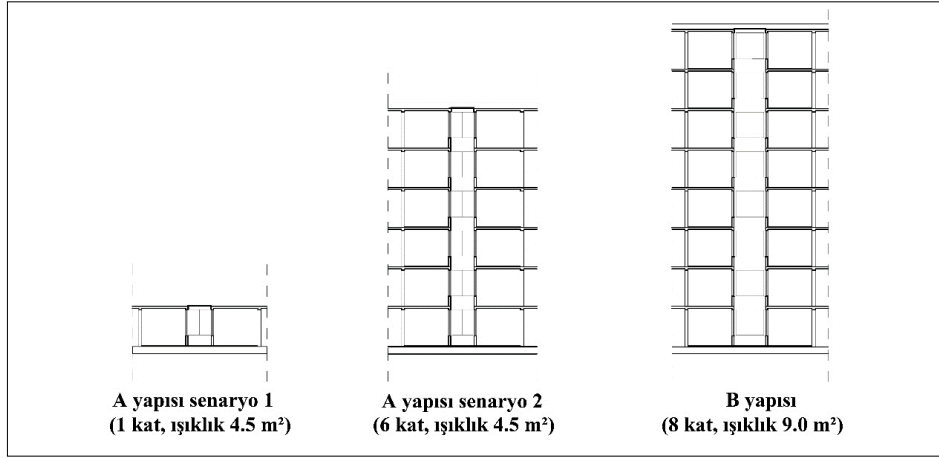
The sections of building A and building B (A binası ve B binasının bölümleri)
